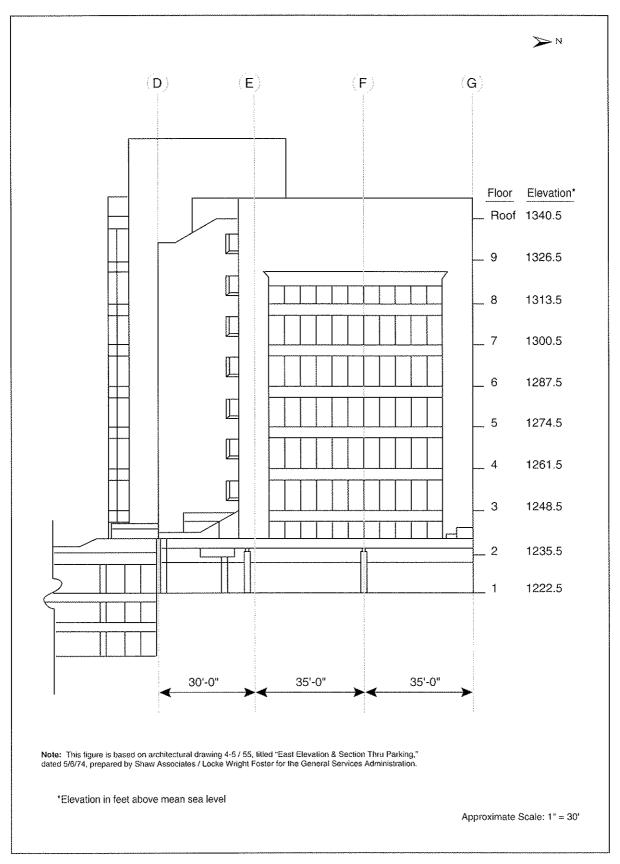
East elevation – nine-story portion of Murrah Building.
